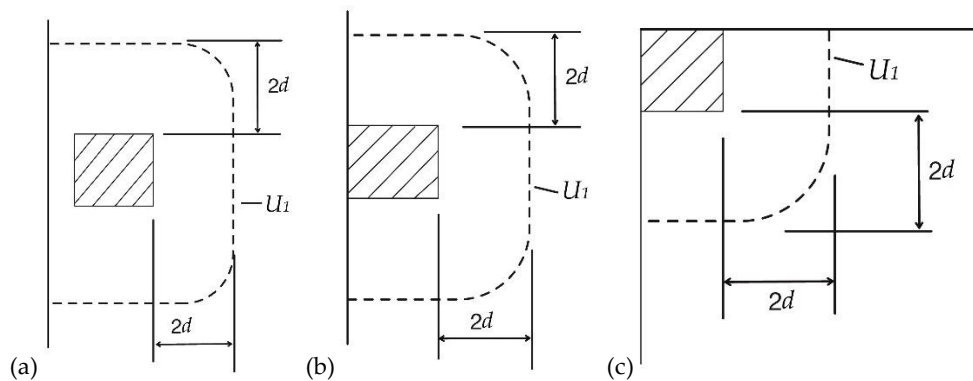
Basic control perimeter for an interior, edge, and corner slab-column connection, modified forms [8]: (a) interior slab-column connection; (b) edge slab-column connection; (c) corner slab-column connection.
